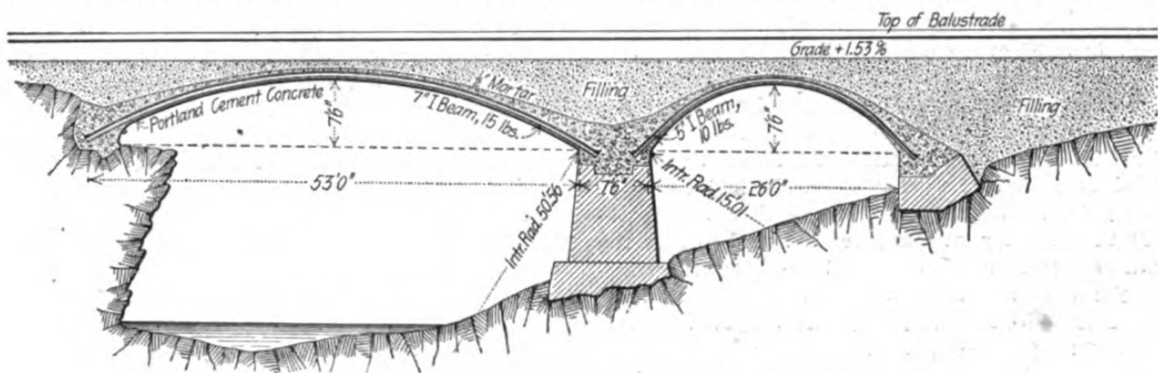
Coach House Bridge Section. Source: *Engineering News*, November 10, 1898, 291.
